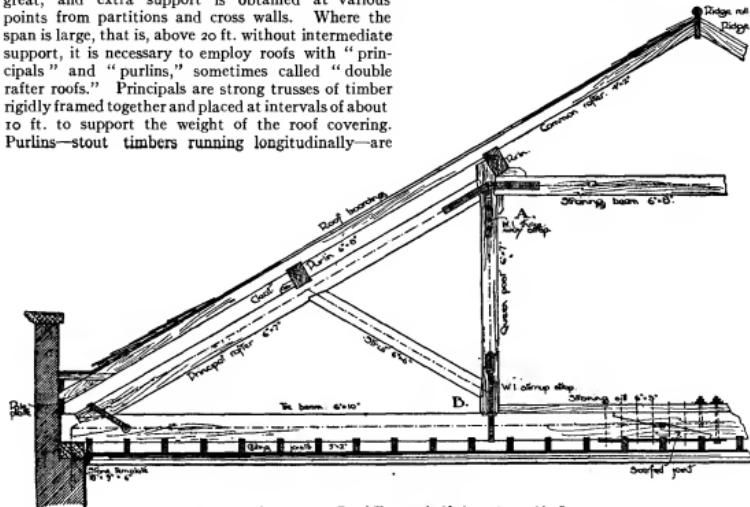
Queen-post Roof Truss; half elevation, 38' 0" span.
